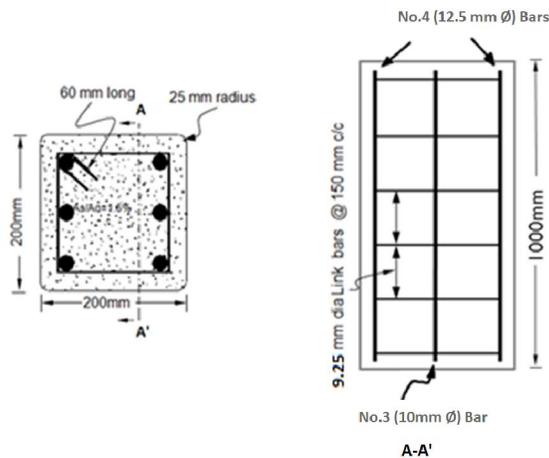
Steel reinforcement bars arrangement in square concrete columns.
